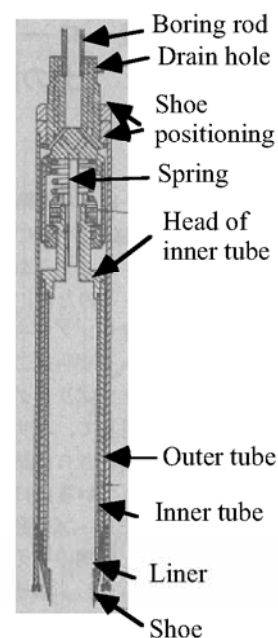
Mechanism of soil sampling at bottom of bore hole
